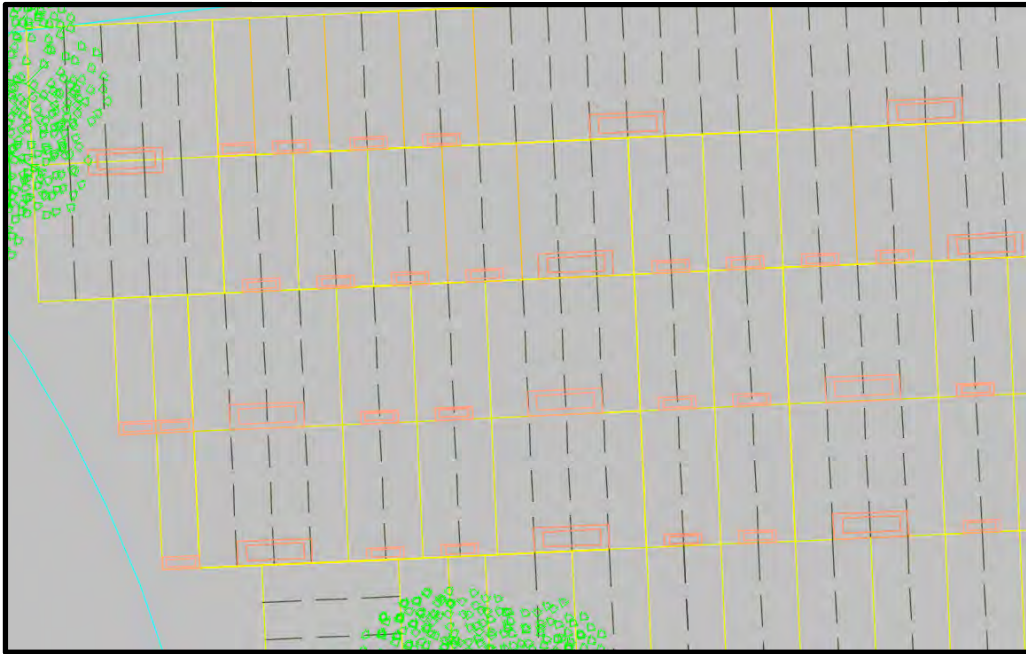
Plan View Area 5 Proposed Lot Layout
